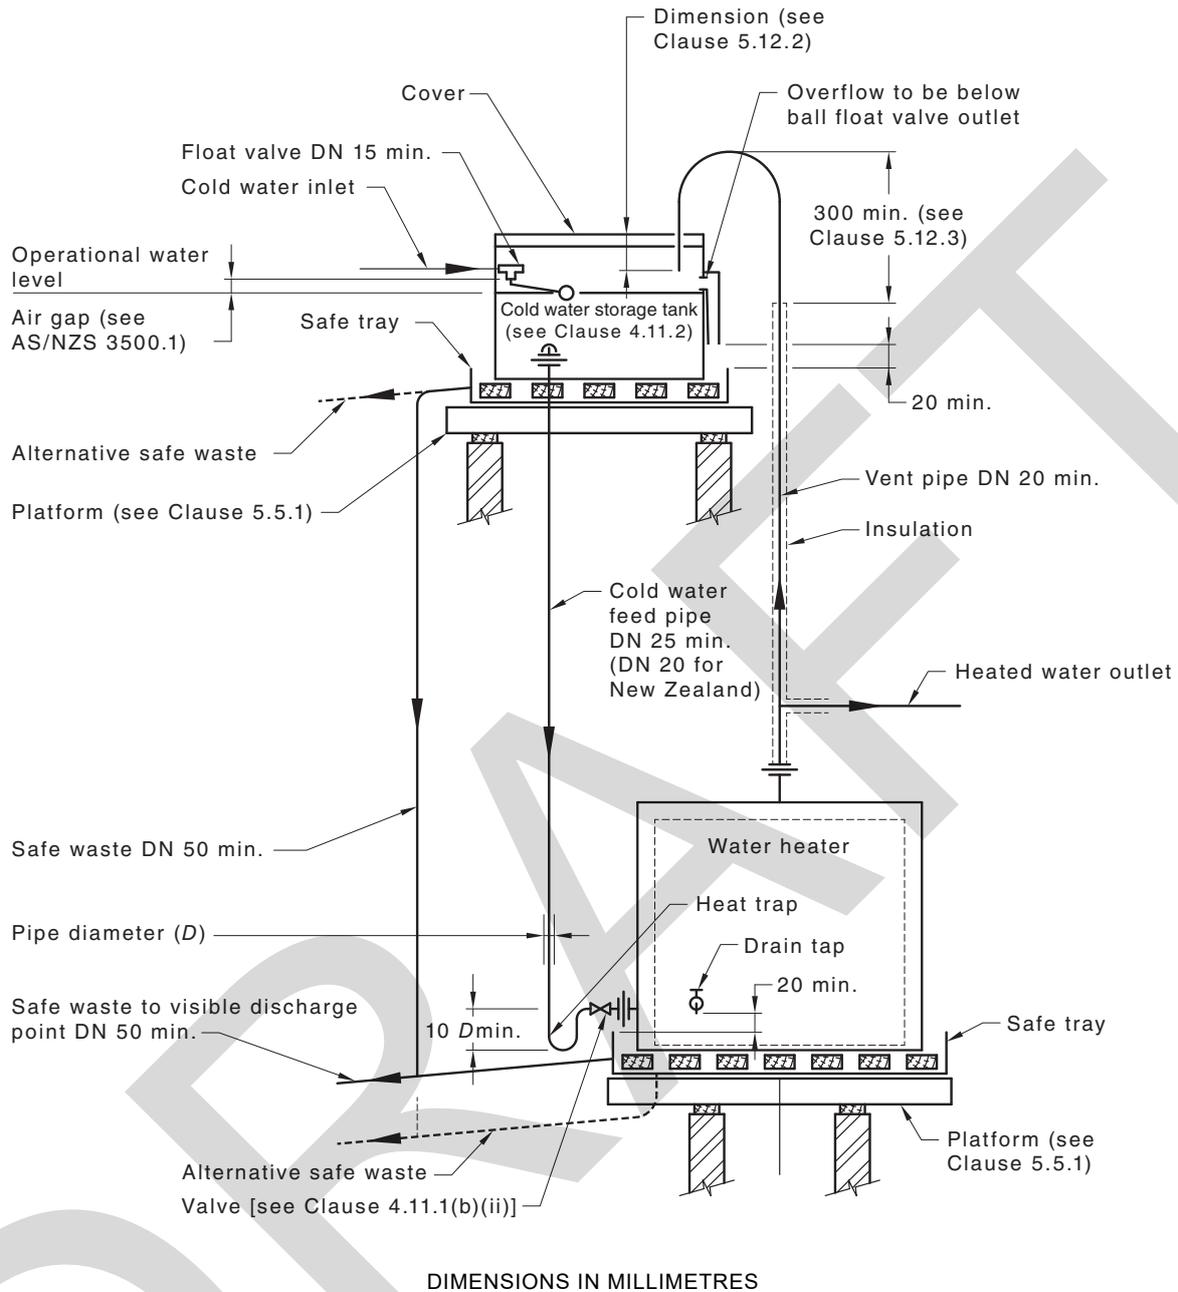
TYPICAL INSTALLATION IN ROOF SPACE OF COLD WATER STORAGE TANK-FED WATER HEATER WITH SEPARATELY MOUNTED COLD WATER STORAGE TANK
